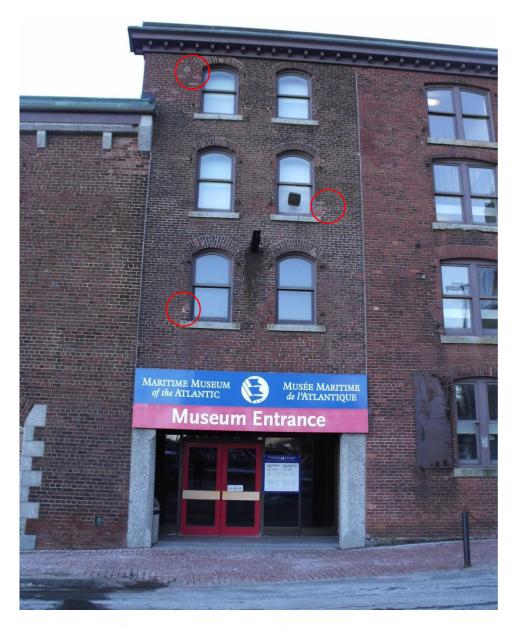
The infilled section on the building's north face. Note missing brackets for iron shutters at repair points (red).
